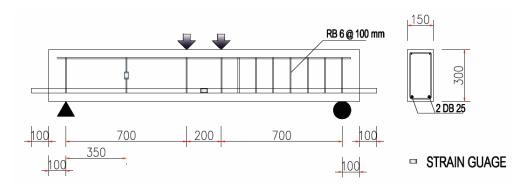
Detailed diagram of a RC beam (Unit: mm)
